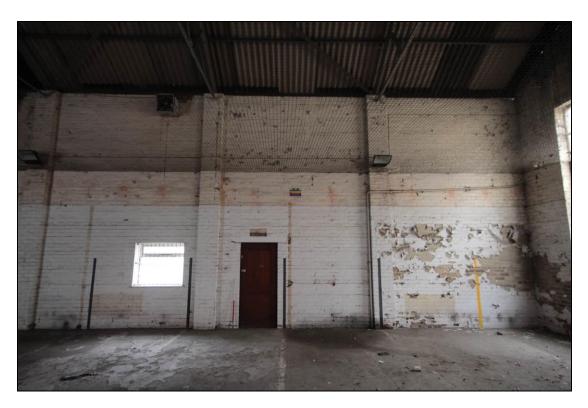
The western end of the south eastern wall, facing south east. Scale 1m.
